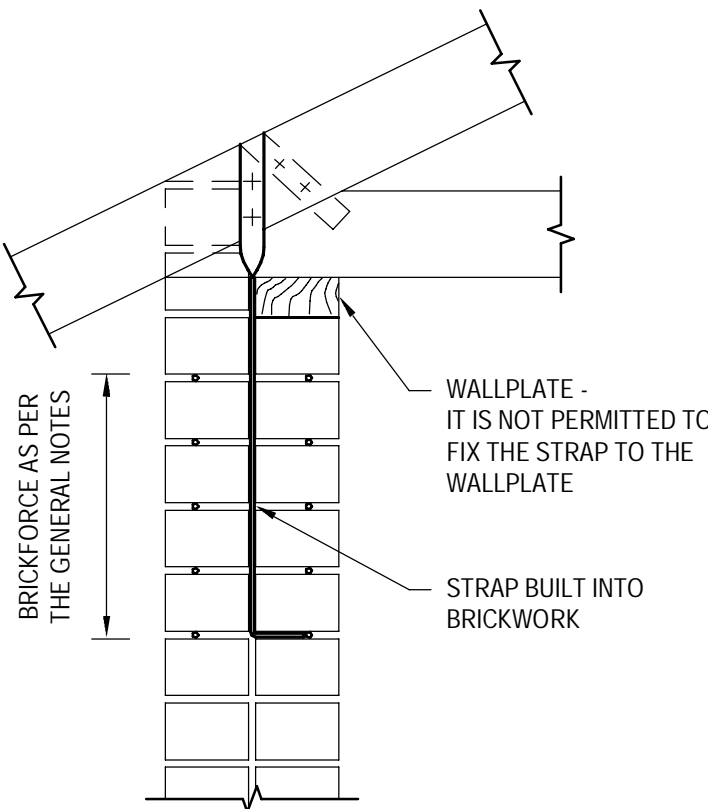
DETAIL TO BE USED WHEN STRAP IS FURTHER THAN 200mm FROM TRUSS
